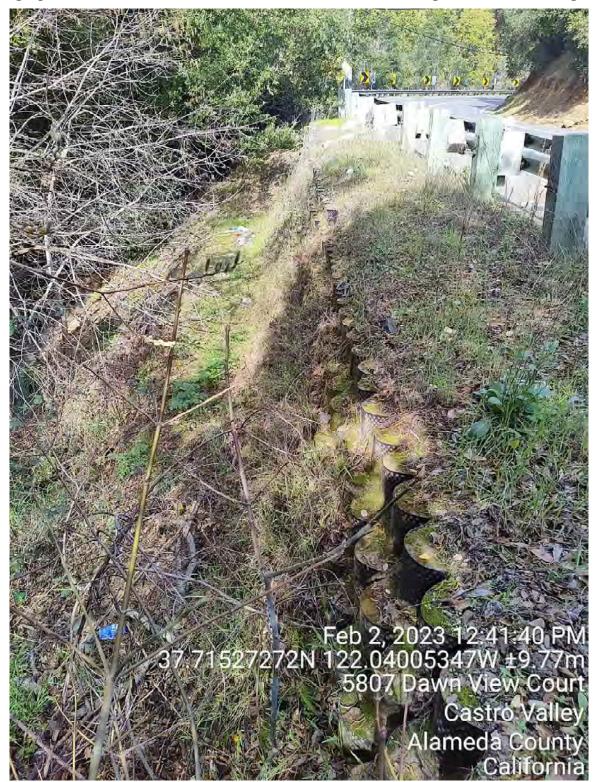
Retaining Wall Adjacent to Northern End of South Guardrail, Looking South
